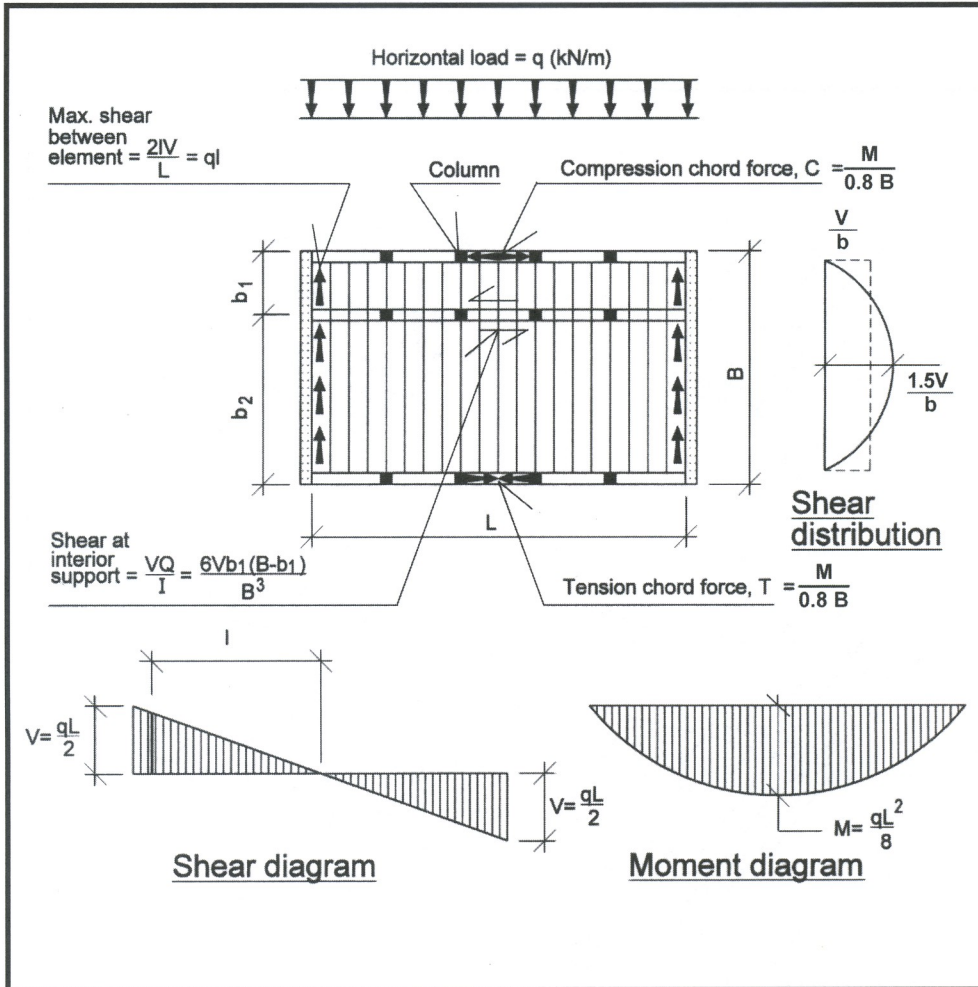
Analogous Beam Design Of A Floor Diaphragm
